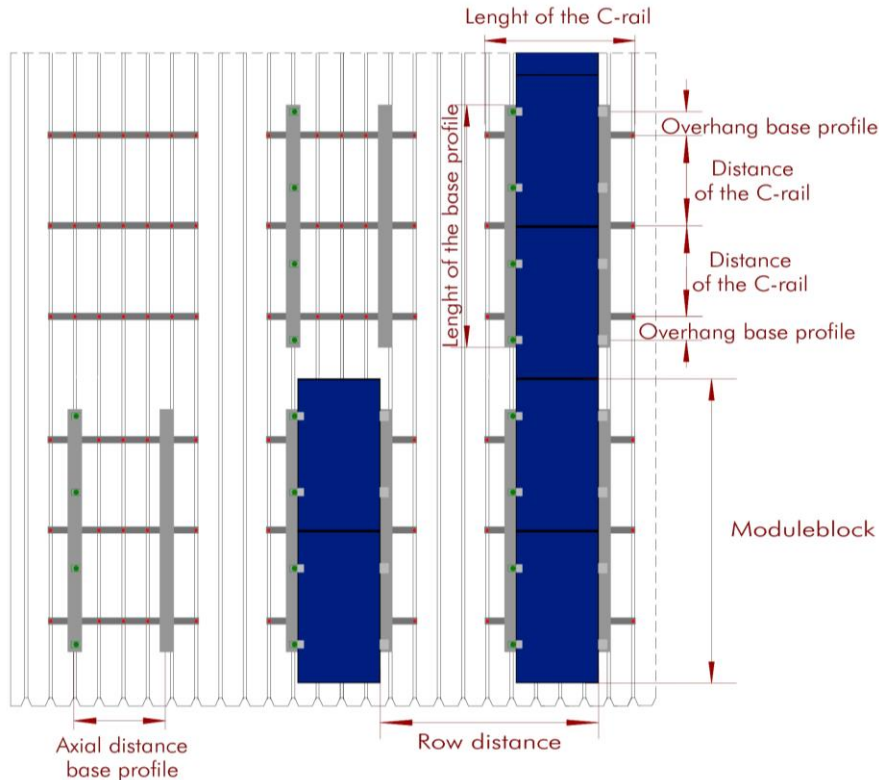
Schematic drawing for fastening the cross rail assembly on the trapezoidal sheet roof
